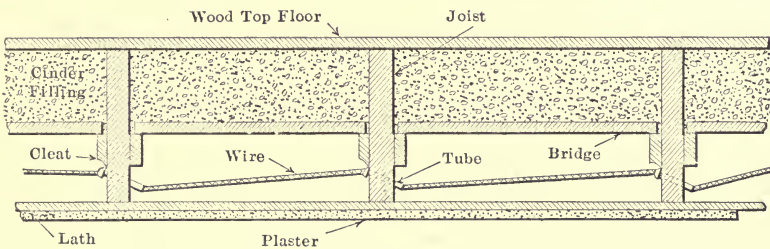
WIRE INSTALLED BENEATH CINDER-FILLED FLOORS.
